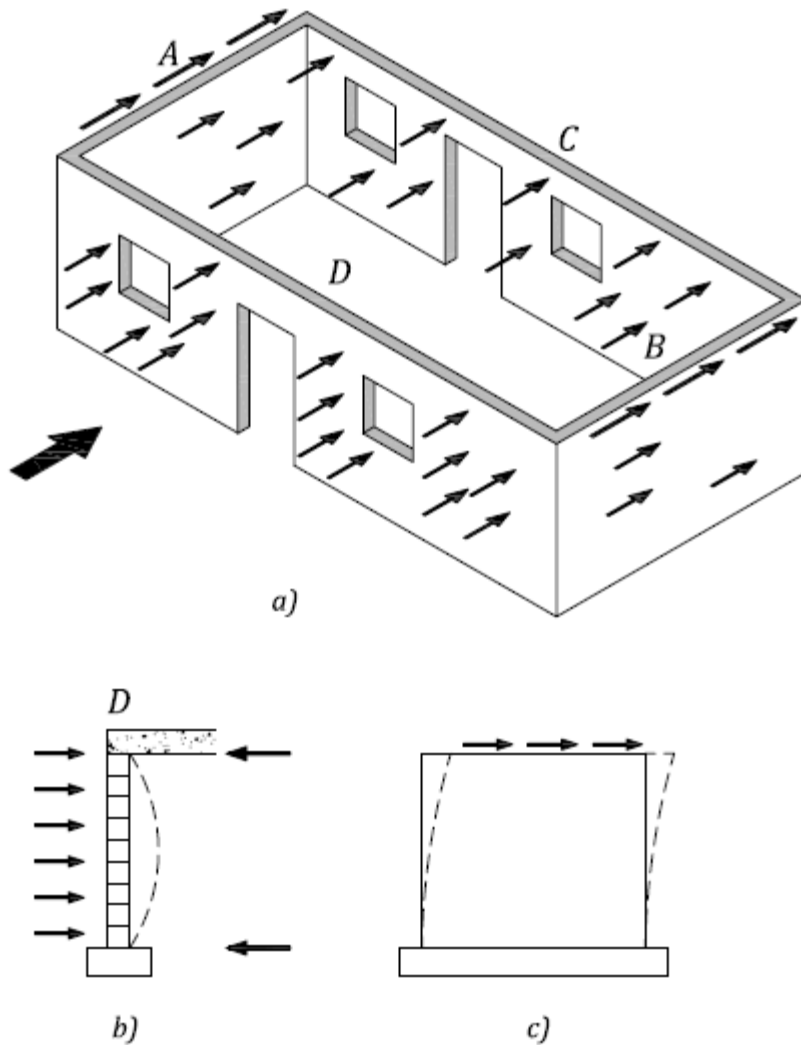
Simple masonry building: a) isometric view showing lateral loads; b) out-of-plane loads; c) in-plane loads (resisted by shear walls).
